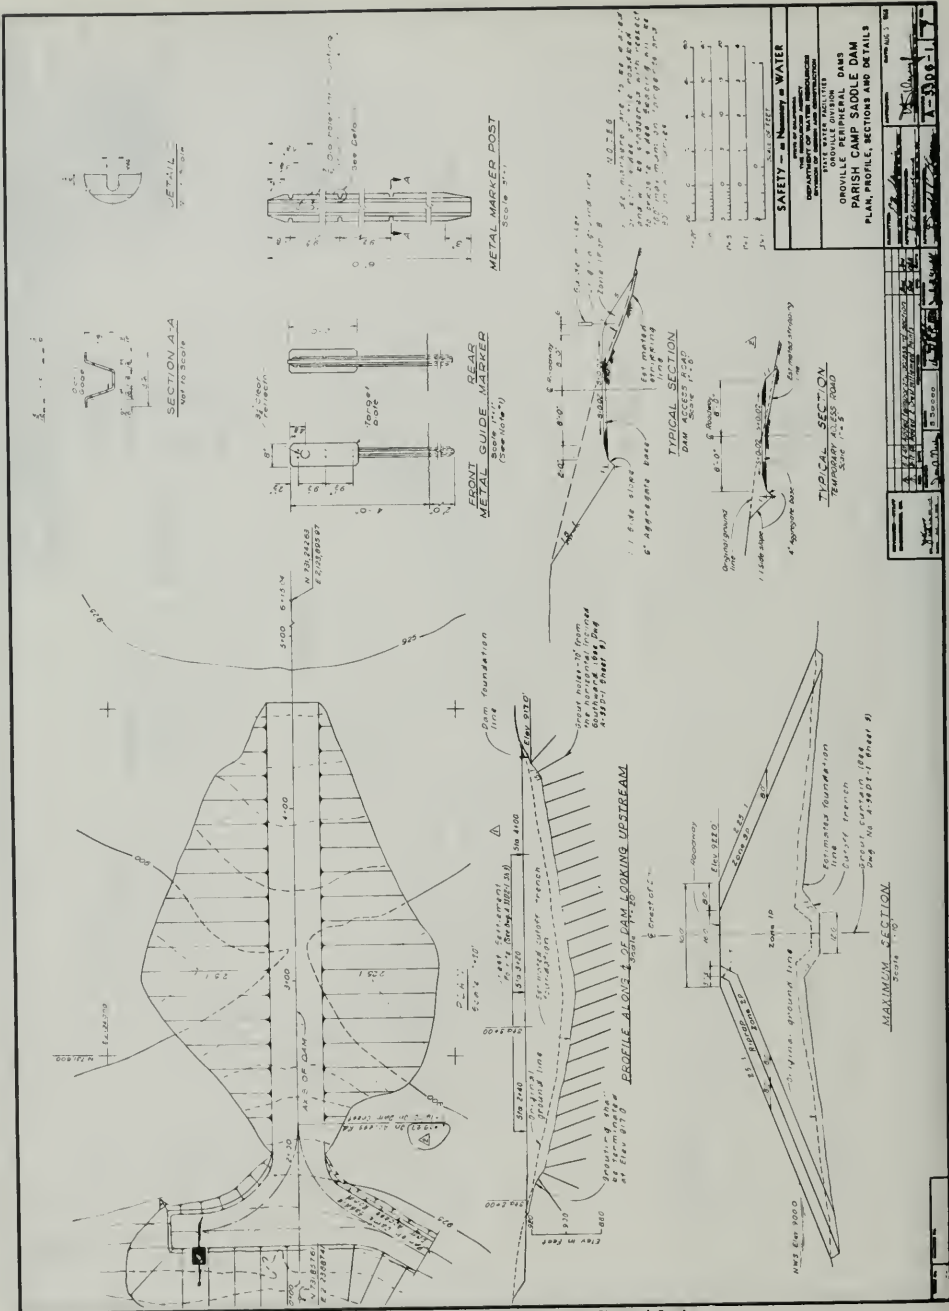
Parish Camp Saddle Dam—Plan, Profile, and Sections
